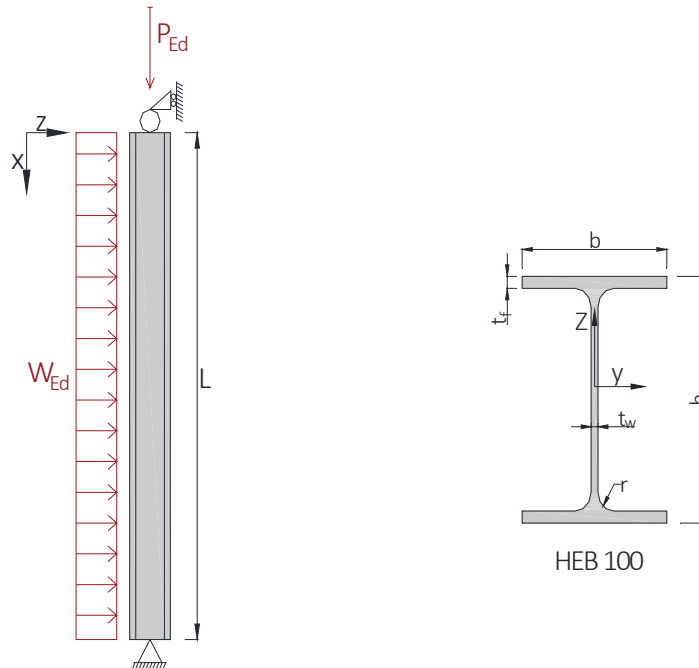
Left: Simply supported column. Right: Cross section (HEB-profile)
